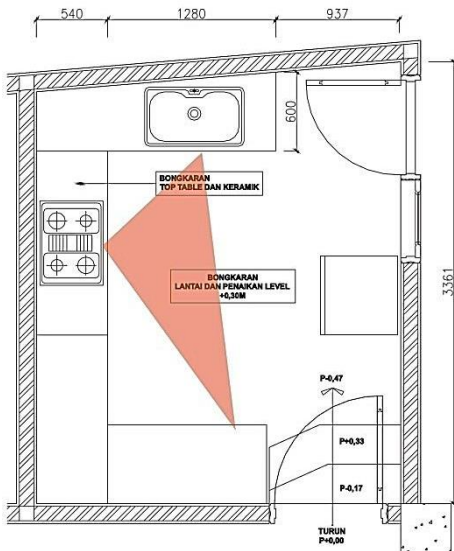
Existing kitchen layout plan (by Author Team, 2019)
